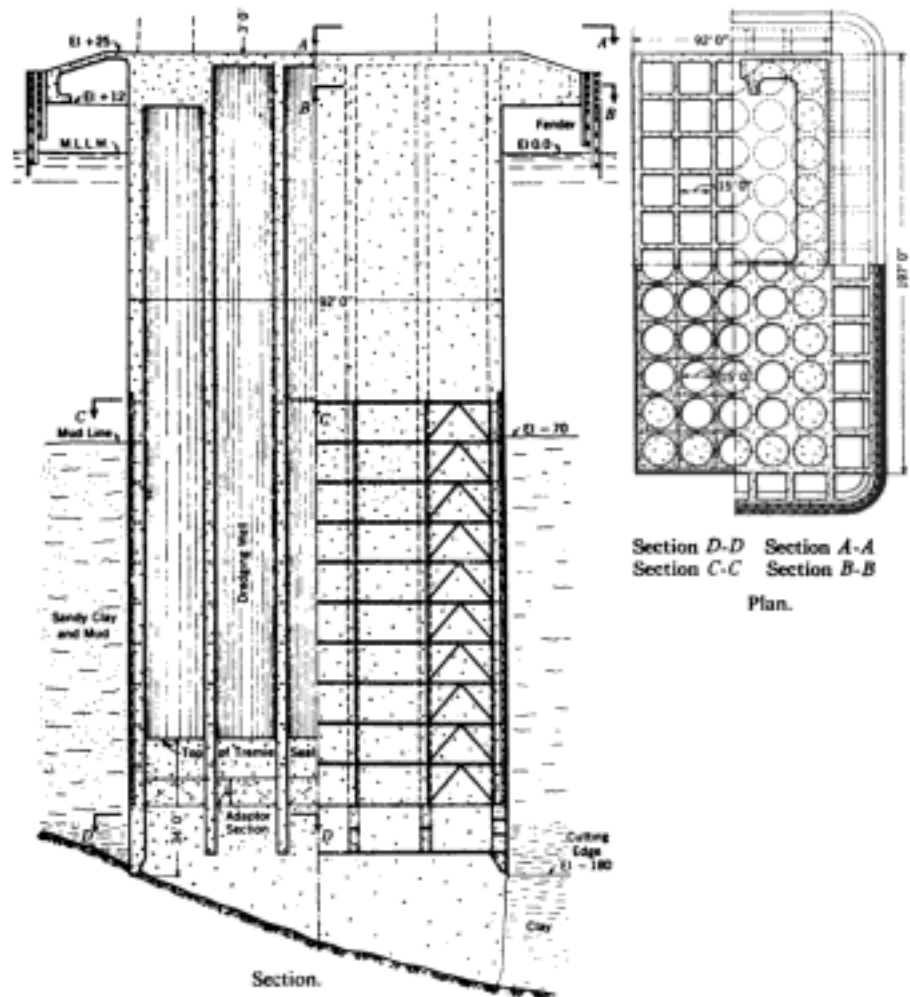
San Francisco–Oakland Bay Bridge: plan and cross-section of caisson for pier W4 at full depth (Little⁹)
